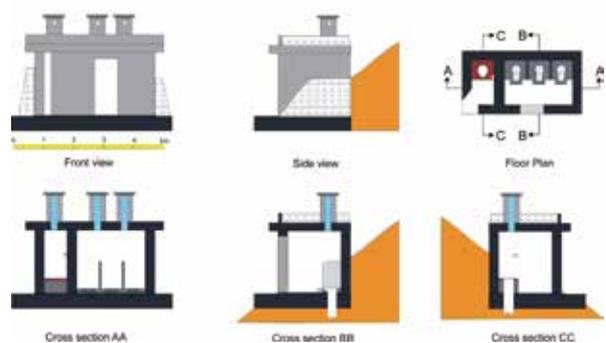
The "common toilet" with three squat pans separated by two short walls. Two ventilation holes on the roof maintained airflow (photo by author, 2015).
